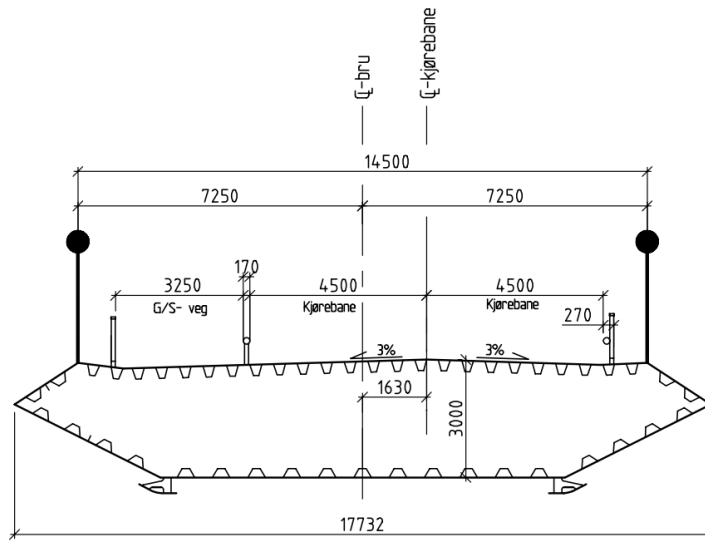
Cross section of the girder. All dimensions in millimeters. [1]
